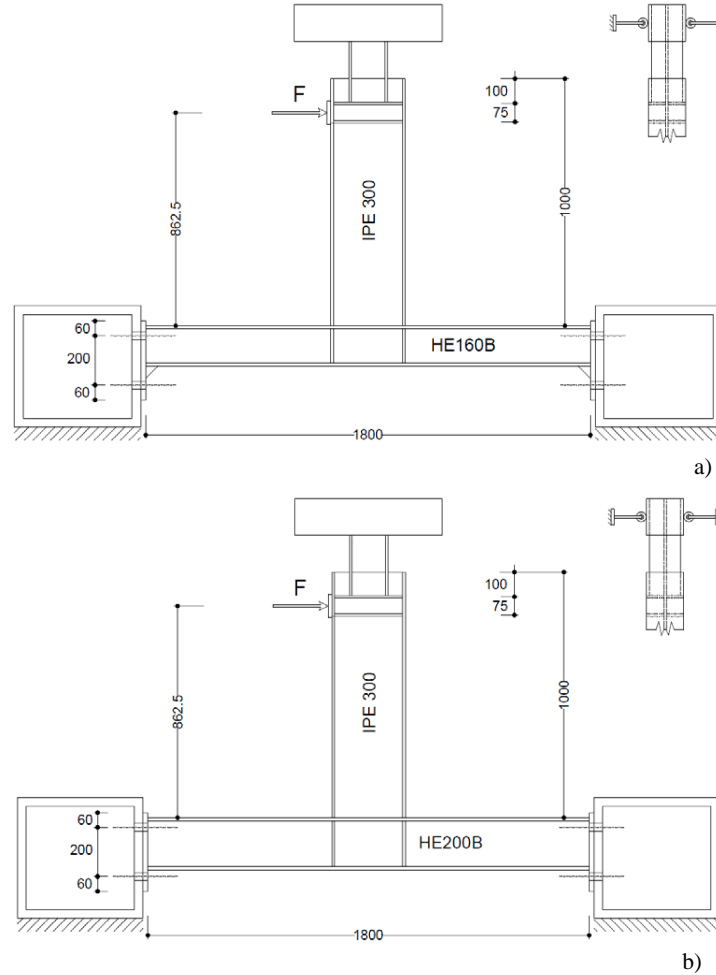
Geometry, boundary and loading conditions of the analyzed specimens: a) BCC5-E; b) BCC6-E.
